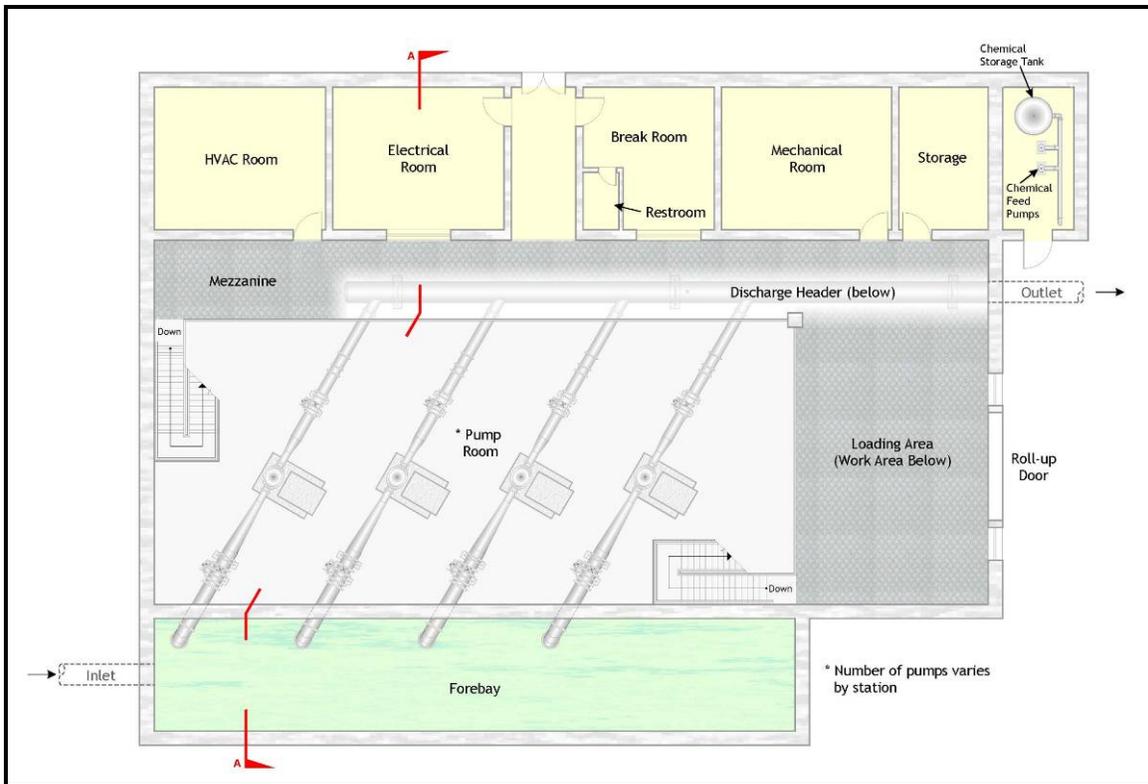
Pumping Station Layout, Preliminary Floor Plan
